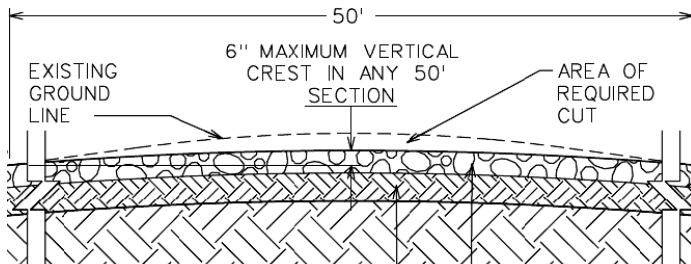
Typical Road Profile Crossing Existing Crest Area
